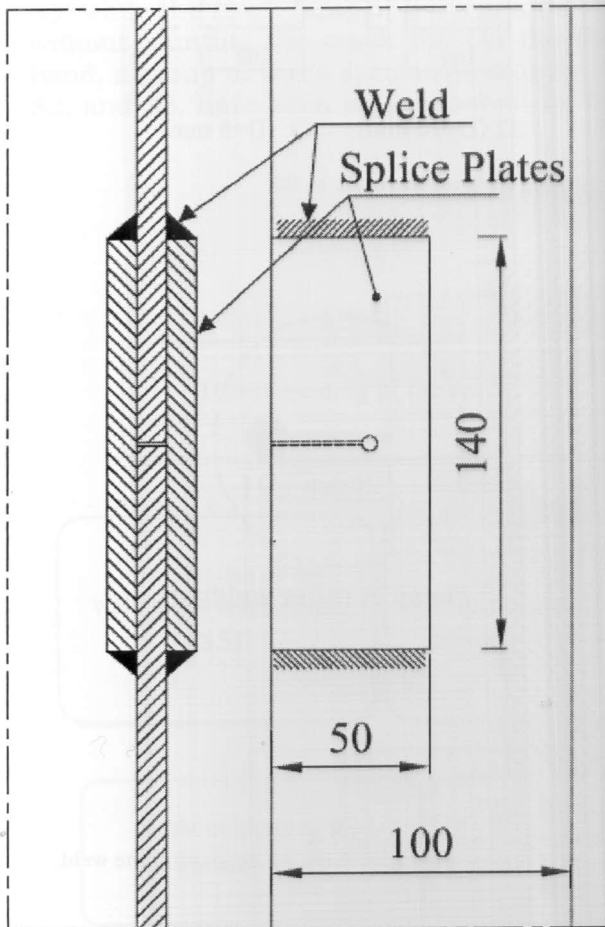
Details for specimen S6, the crack tip is blunted with a 5 mm hole followed by splicing the crack wake with welded plates.
